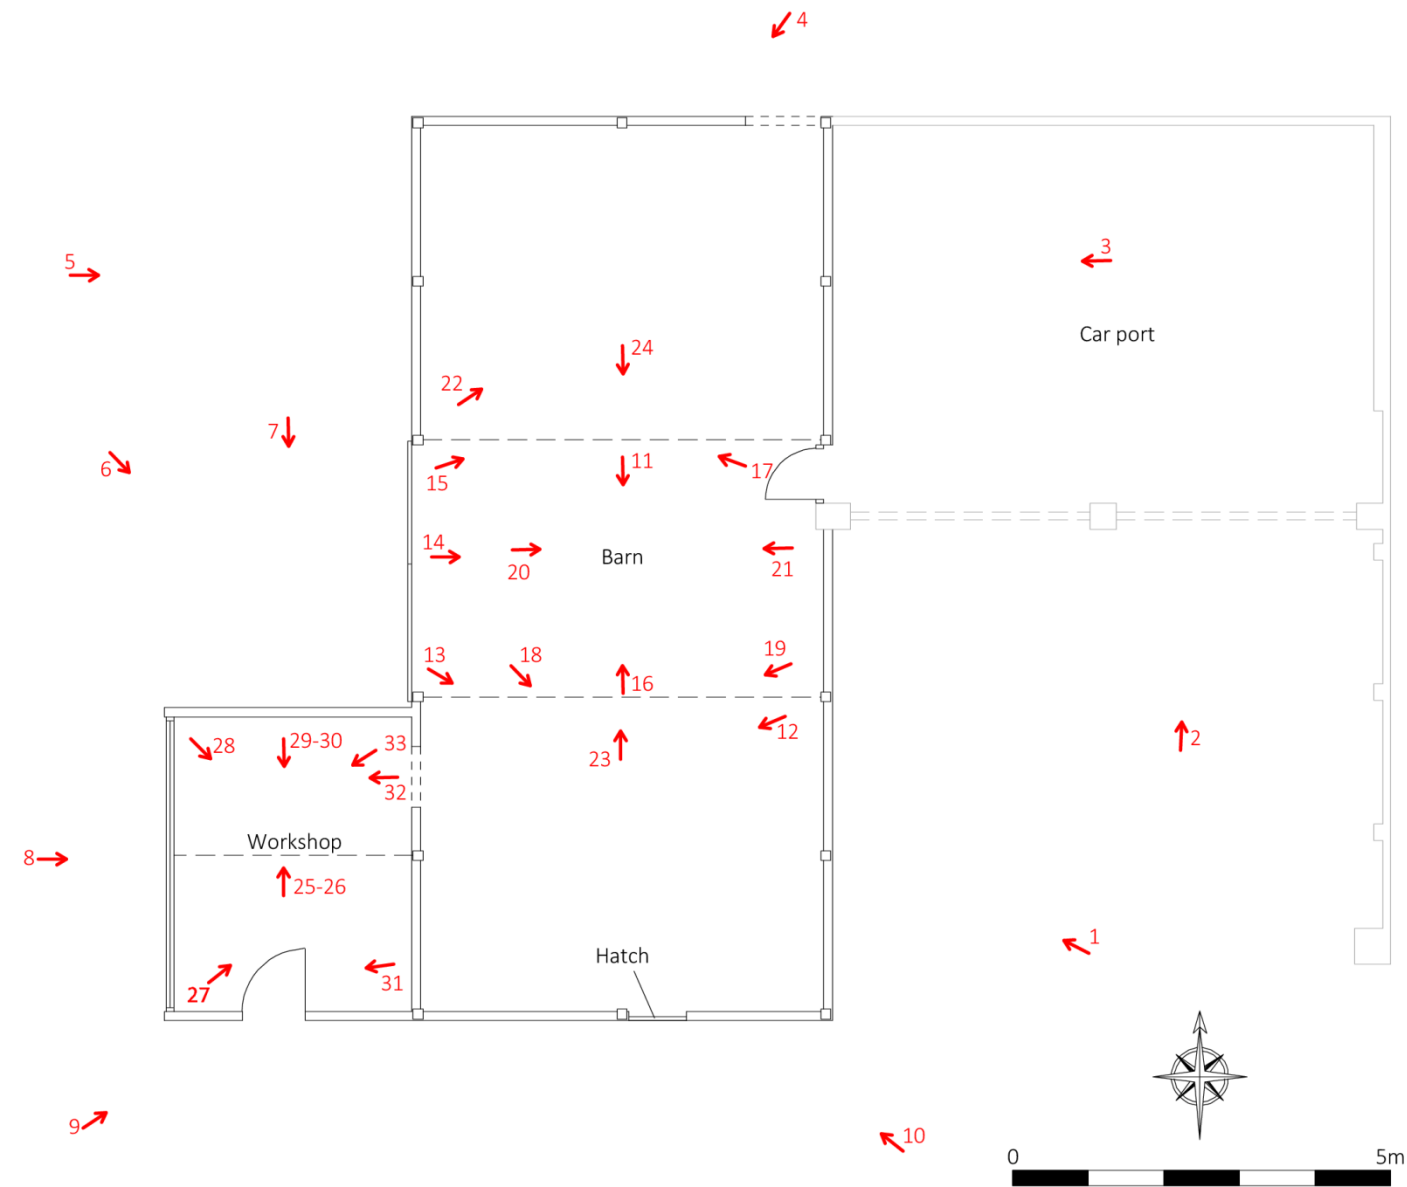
Photo plan; arrow depicts site north (scale 1:100)
